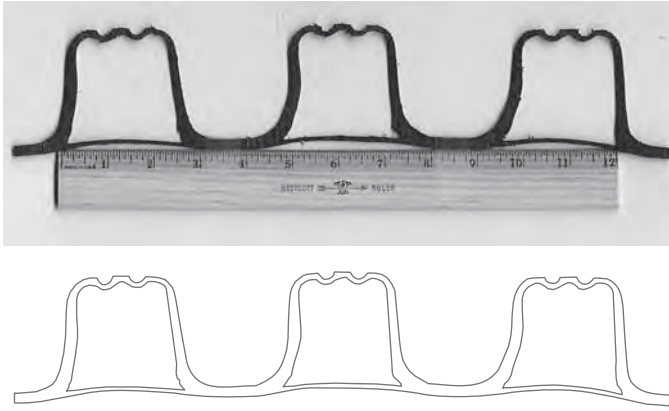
Scanned specimen for section properties with its CAD tracing.
